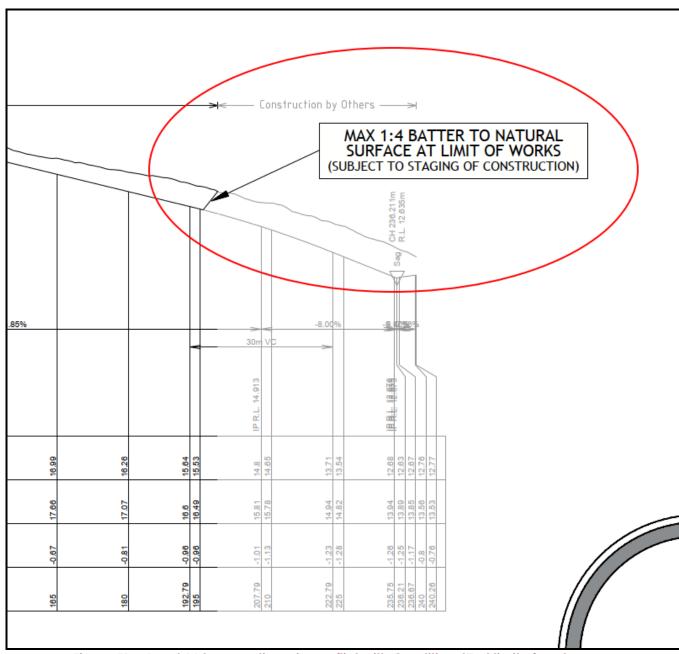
D – Road 16 long section – in conflict with Condition 47 at limit of works.
